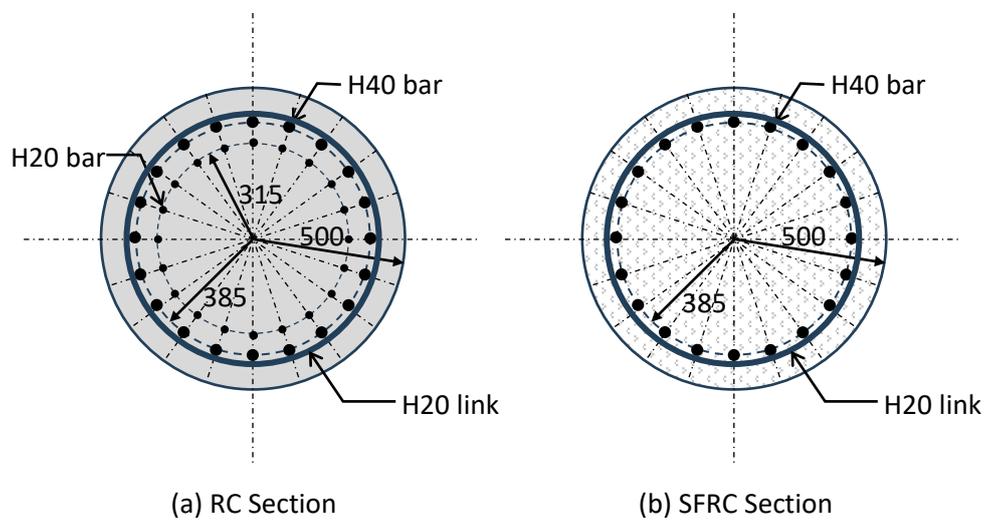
Cross-Section of Bored Pile (All dimensions are in mm.)
